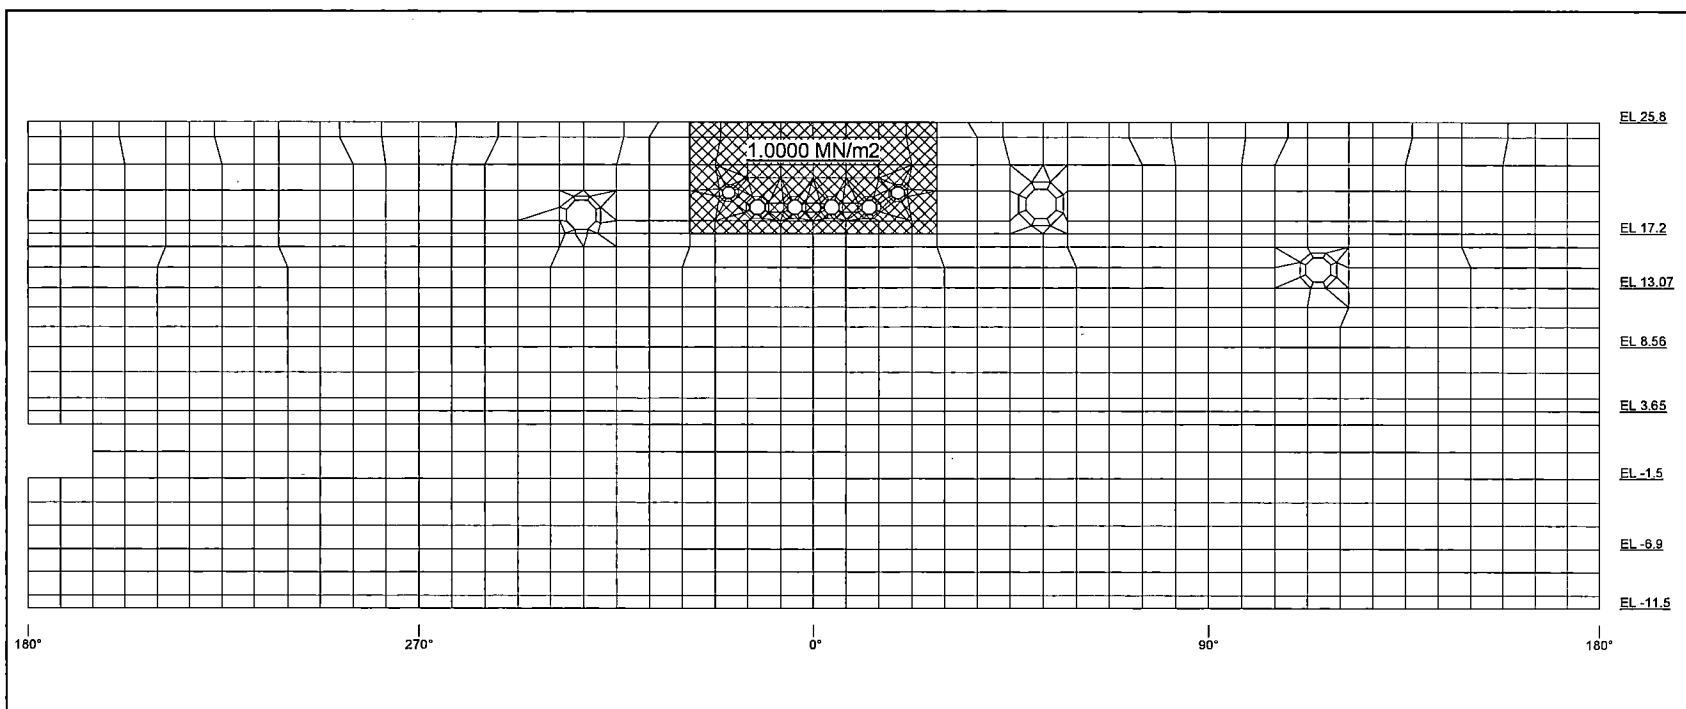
HELB Pressure Load (MS Tunnel: RCCV Wall)
